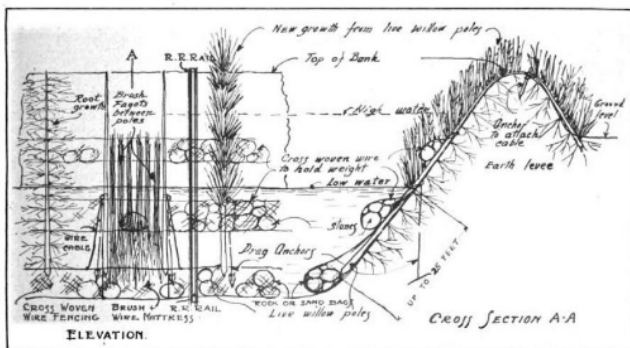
SKETCH SHOWING SYSTEM OF RIVER CONTROL BY WILLOW POLE PLANTING
